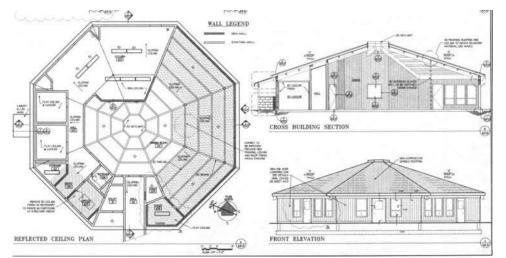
Reflected ceiling plan (left), cross building section (top), and front elevation (bottom) for remodeled Building 7. Source: Elevation, Section & Reflected Ceiling Plan, "Bushell Kitchen & Dining Room Modification & Addition, Lincoln Child Center," Byrens Associates, sheet A3.0, dated August 23, 1999.
